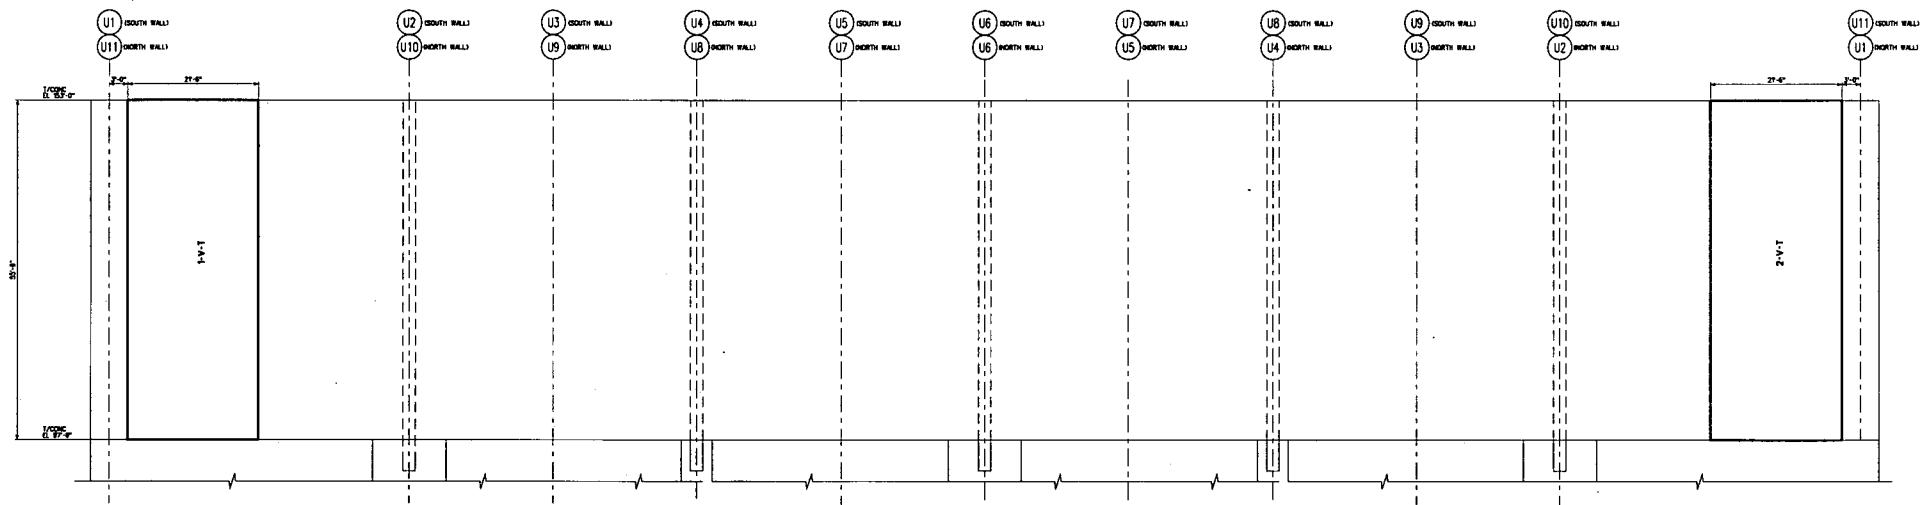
FAN NORTH WALL LOOKING SOUTH & SOUTH WALL LOOKING NORTH
